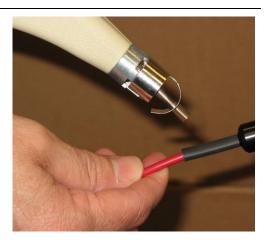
Securing Fuse holder Load Lead Wire Connection With Heat Shrink
